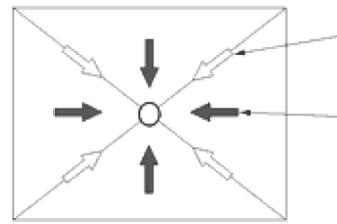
Scheme of junction of roof slopes in place of rain water gutters
